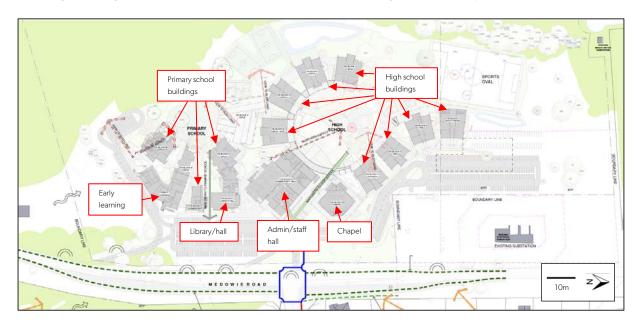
| Site plan of the proposed development (source: RtS 2019)
